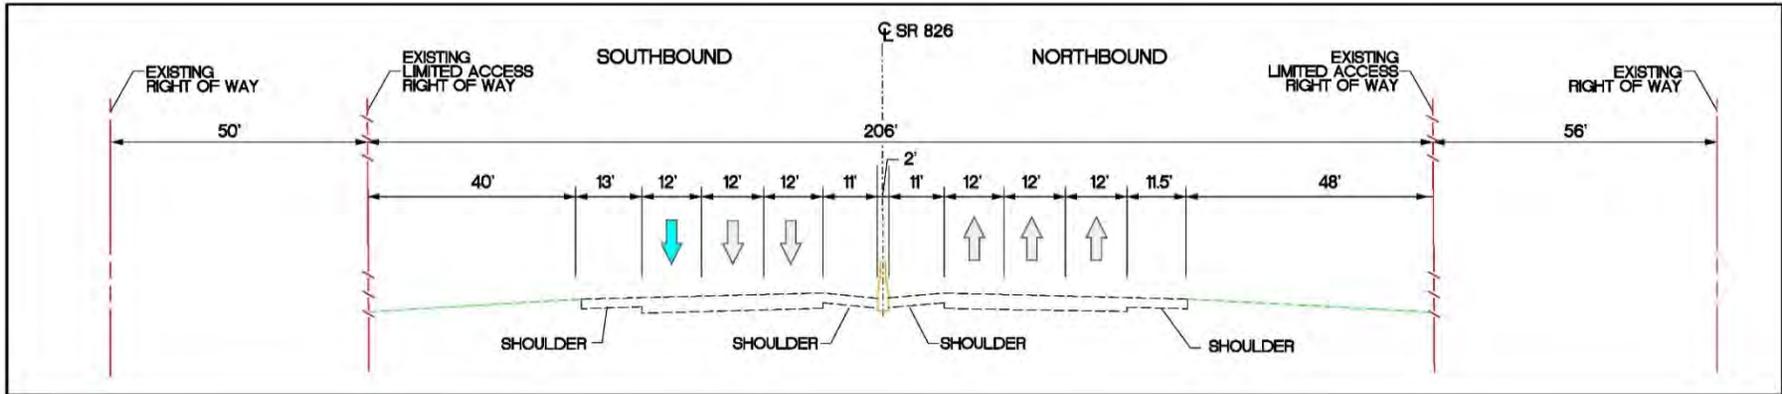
Existing Roadway Typical Section between US 1 and SR 874
